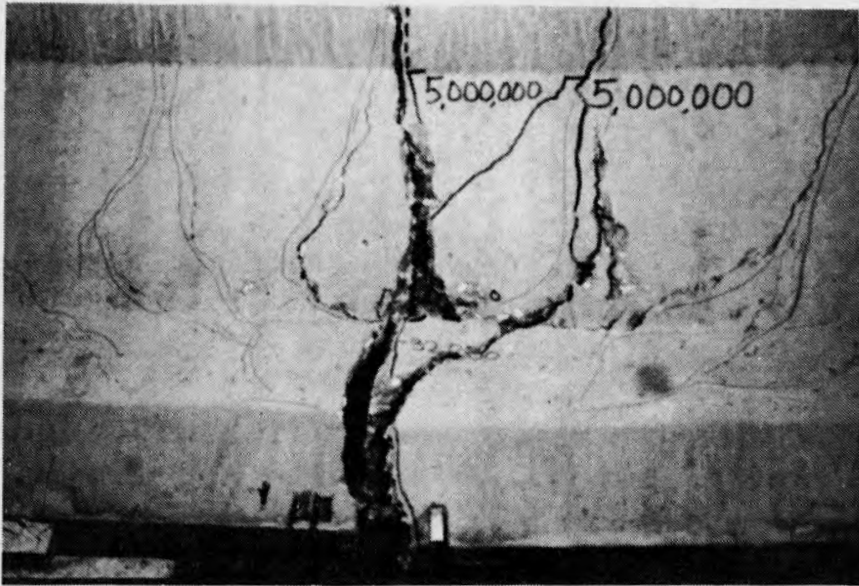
Failure crack for Specimen A-22-NP-6.2-NO-5.00
